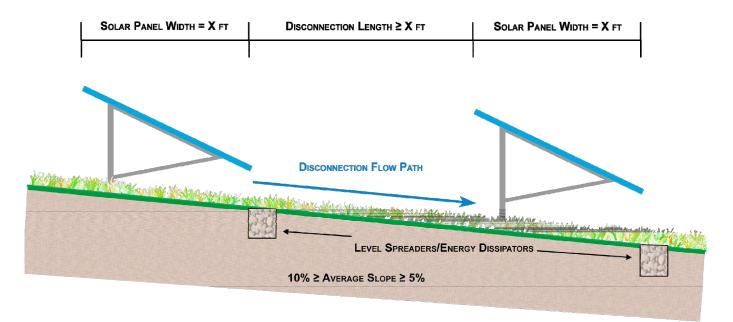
Typical Installation – Slope \geq 5% but \leq 10%
